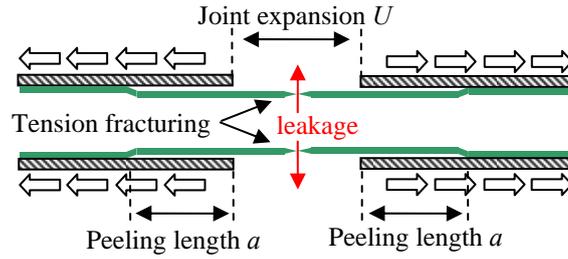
The leakage mode caused by fracturing of the seal hose
